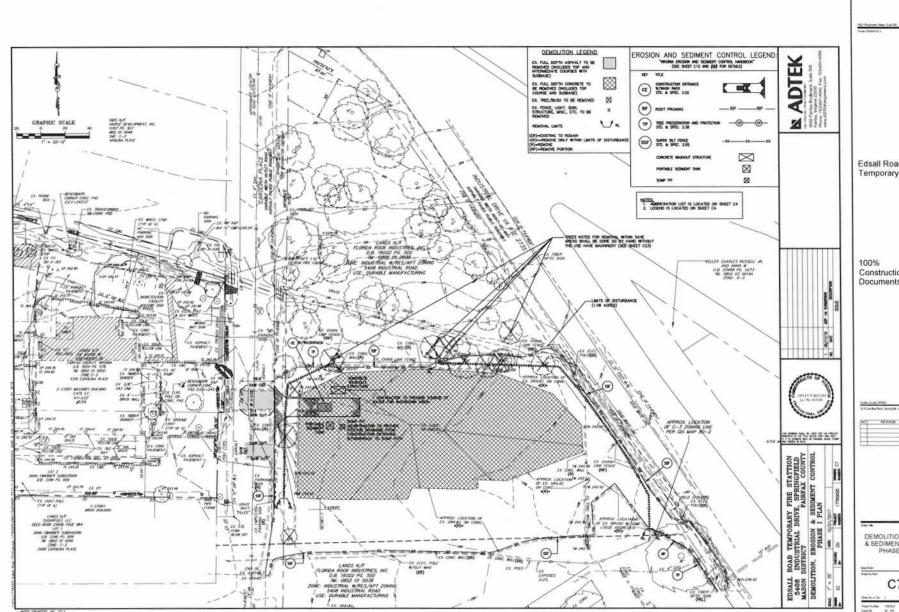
FAC	ILITY	SITE	PLANS
